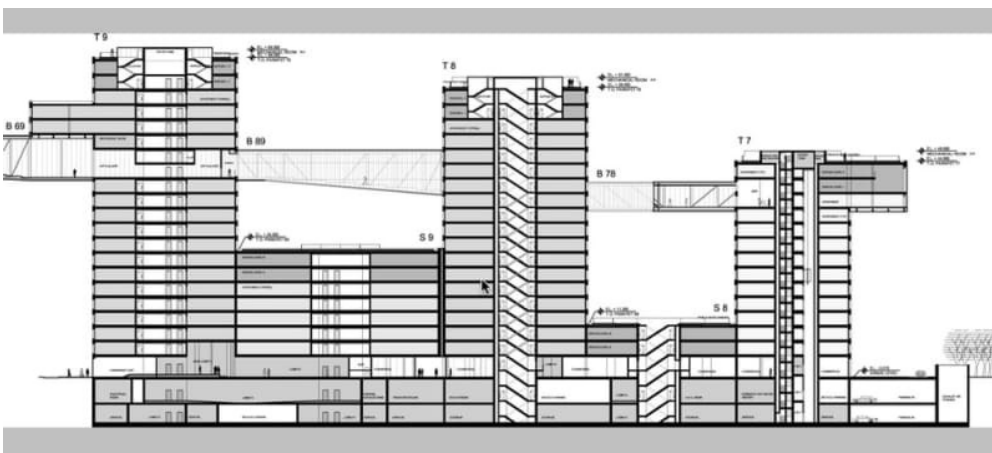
A sectional elevation of Linked Hybrid. Source: (ArchDaily, 2009)
